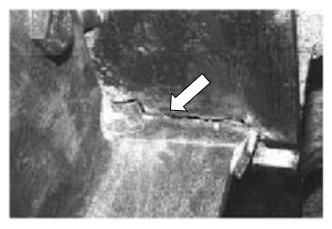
Fractured welded beam flange to column flange connection in building discovered following the 1994 Northridge earthquake
